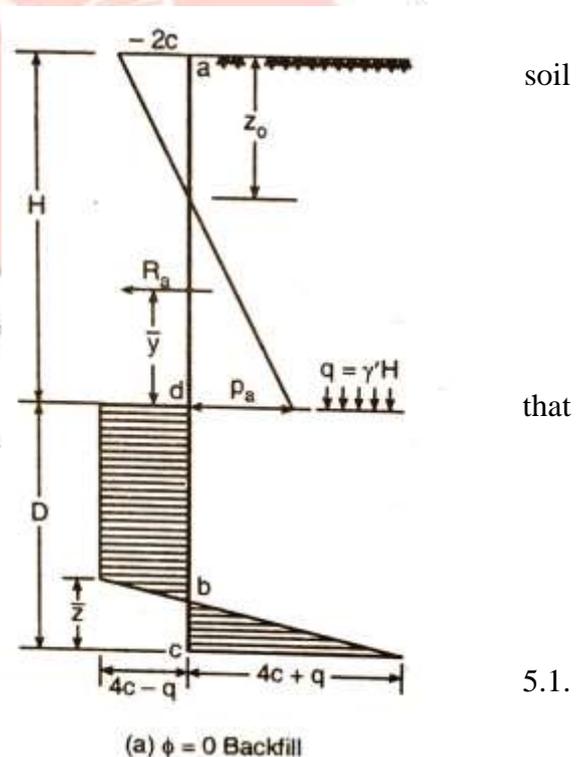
shows Cantilever Sheet Pile Wall in Cohesive Soil
